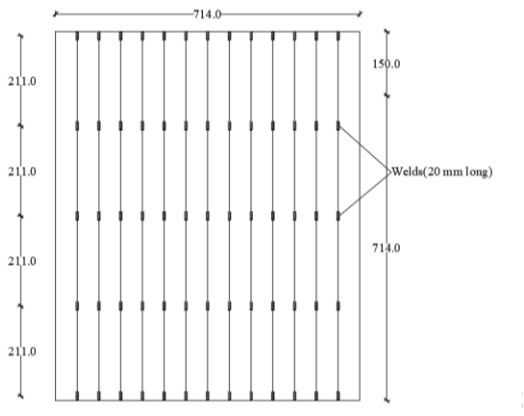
Elevation view A-A with welding details of CFCSW2 and CFCSW3 (units in mm)
